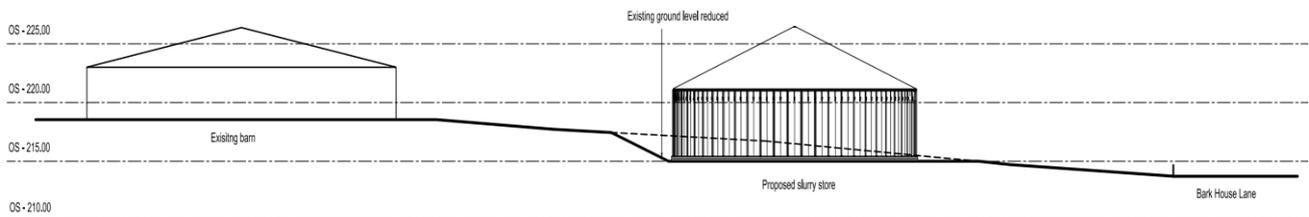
Site Sectional Drawings showing proposed Slurry Tank at Bark House Dairy Farm, Huddersfield Road, Shelley, HD8 8LJ.
